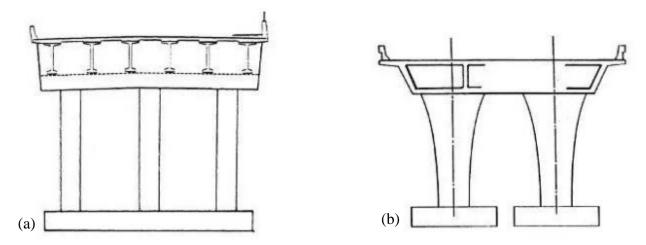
Bent Pier (a) for precast girders, and (b) for cast-in-place girders
